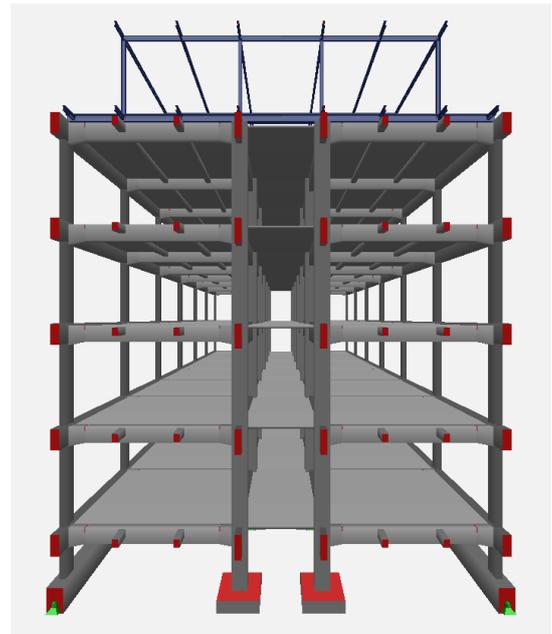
Assessment of a new penthouse on the framework structure on a main fabric building (the Office of Professor Pfeifer and Partners, 2008)
